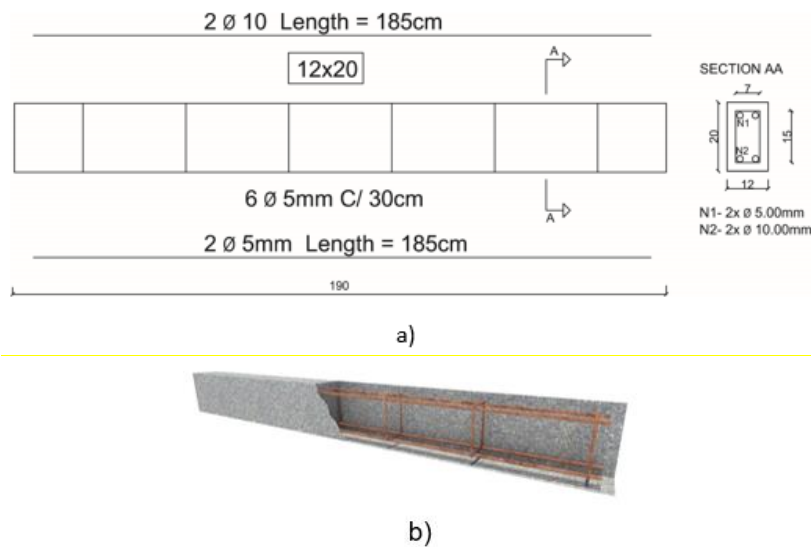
Detailing of the reinforcement in the beams - (a) Longitudinal detailing; (b) Frame perspective
